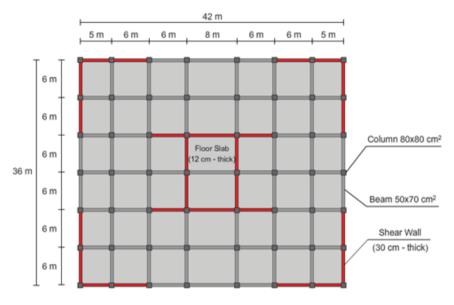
Floor Plan of Reinforced Concrete Building Model.
